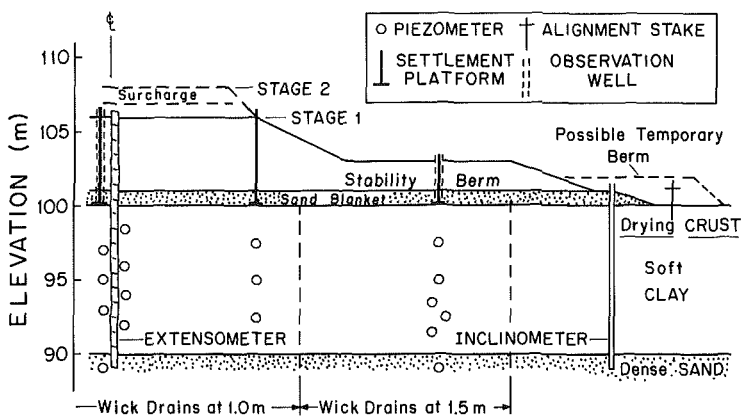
Possible Layout of Instrumentation for Staged Construction of Embankment with Vertical Drains
